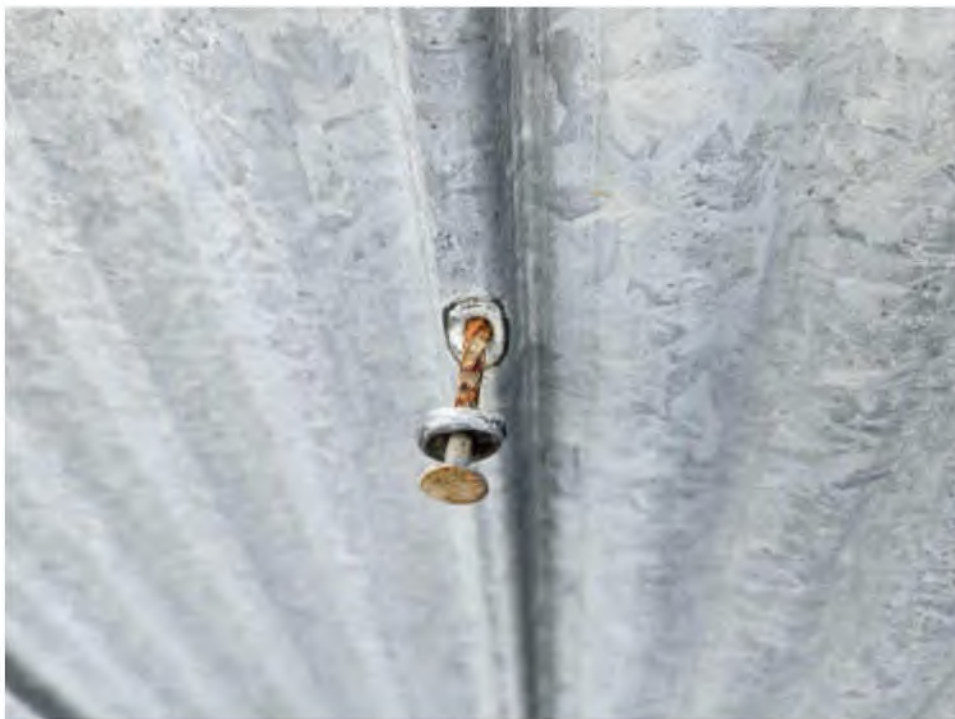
Backed Out and Corroded Fastener at Roof Level Metal Cladding
